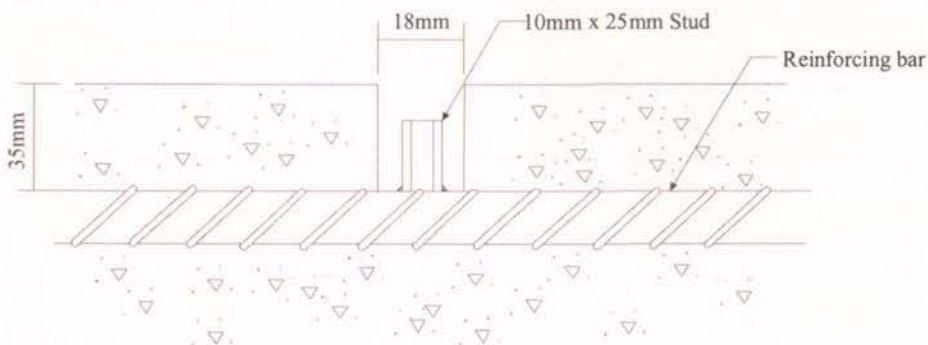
Stud welded to reinforcing bar with surrounding void
